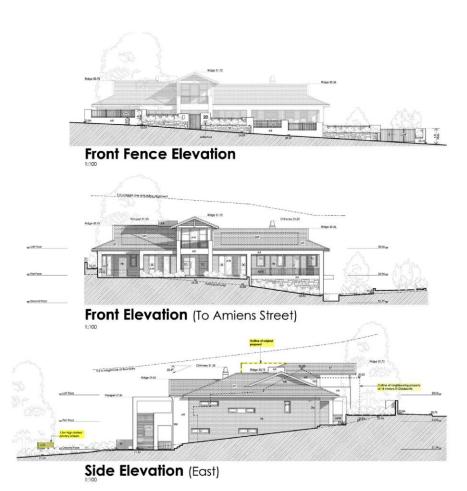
Proposed elevations. (Source: DA Drawings, Alec Pappas Architects, May 2013)
